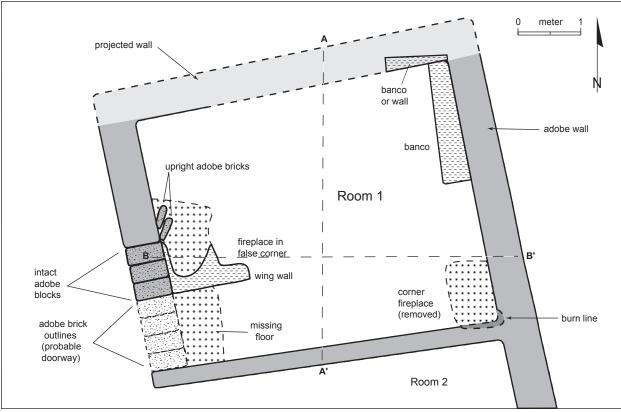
Plan of Room 1, Structure 1 at the Trujillo House.
